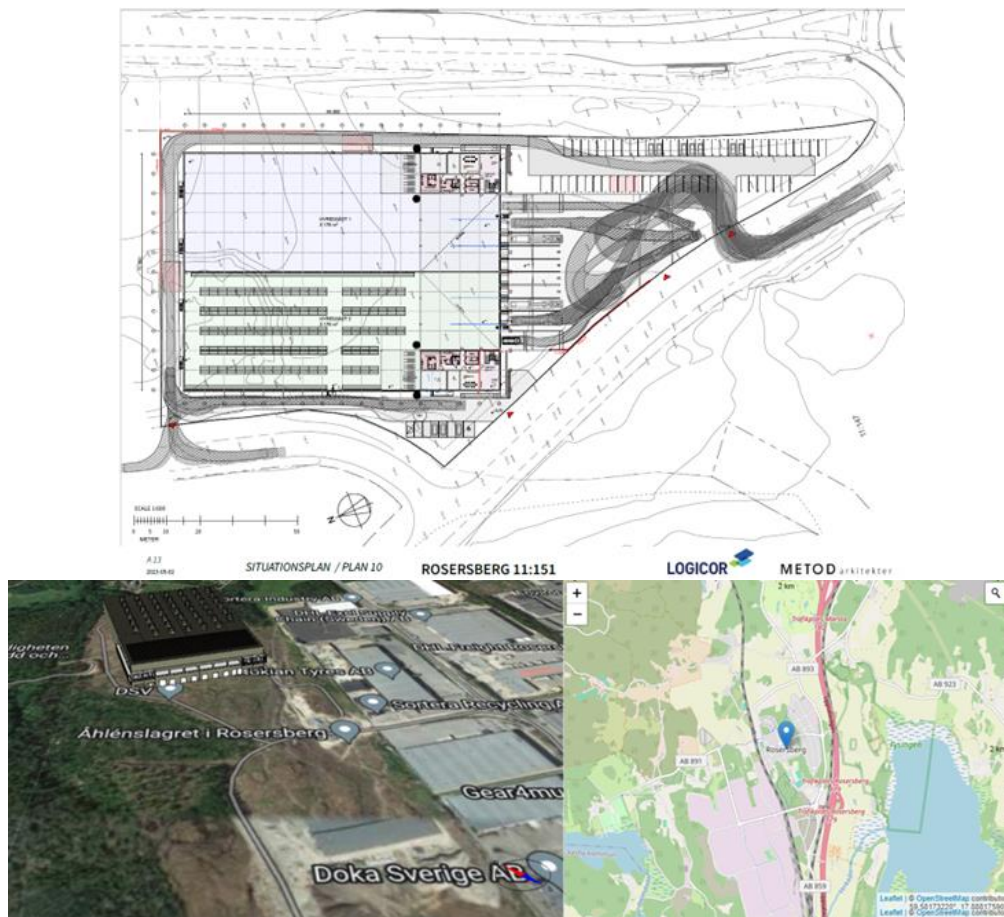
Project's site plan and building layout (source from Logicor & Metod arkitekter, 2023)
